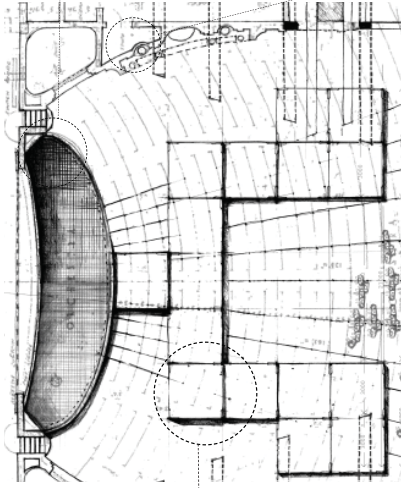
DETAIL H: DETAIL OF ORCHESTRA PIT STAGE
